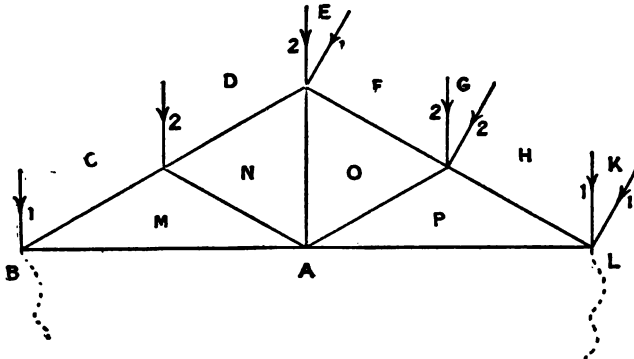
FRAME DIAGRAM OF KING POST TRUSS.
